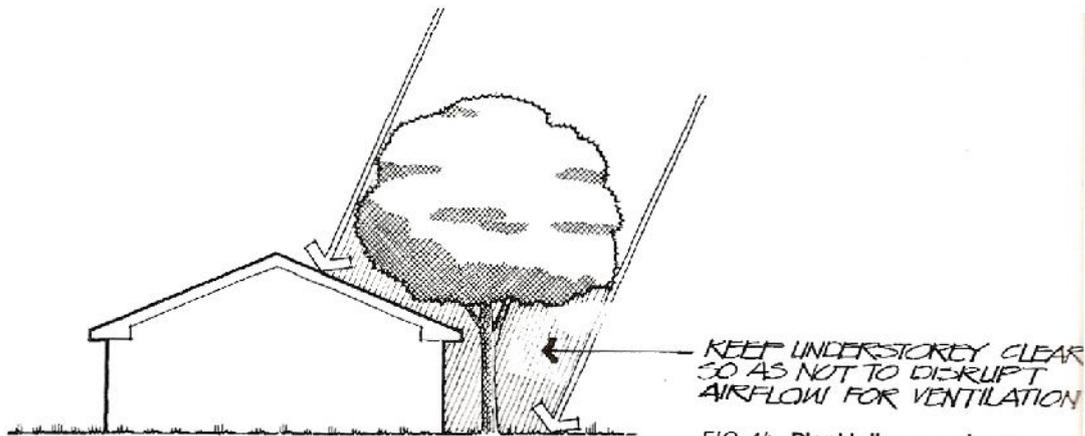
Plant tall canopy trees on south side of house to shade roof and walls.
